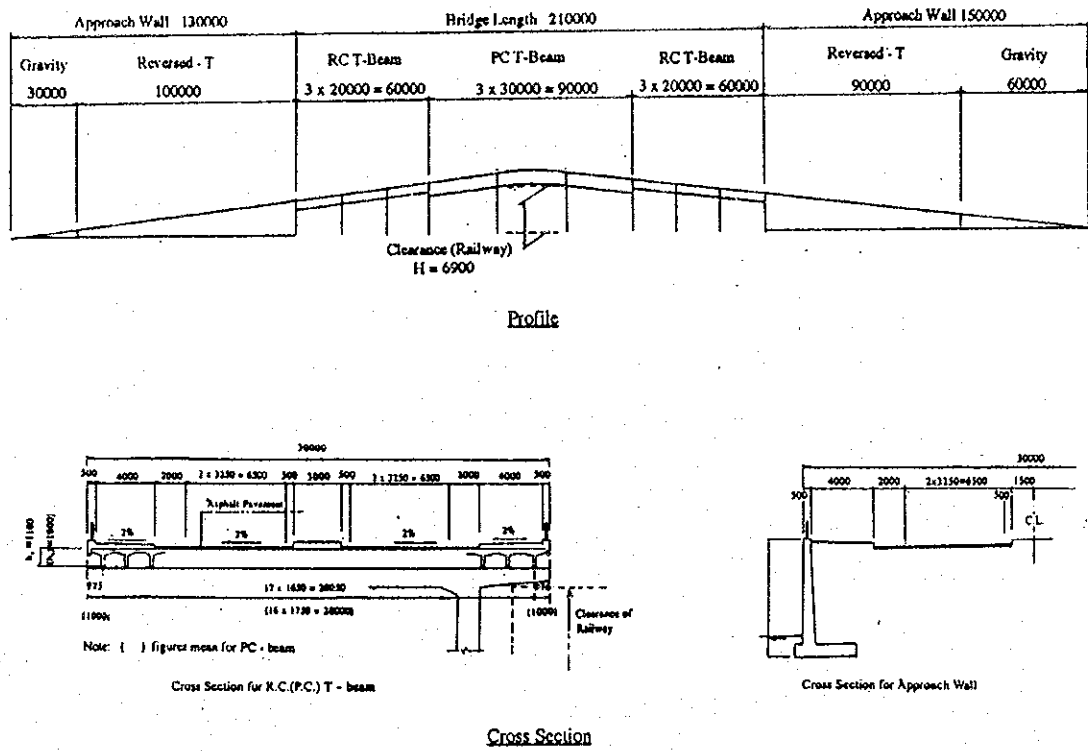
Typical Cross Section and Profile for Teeverchid SW Ext. F/O
